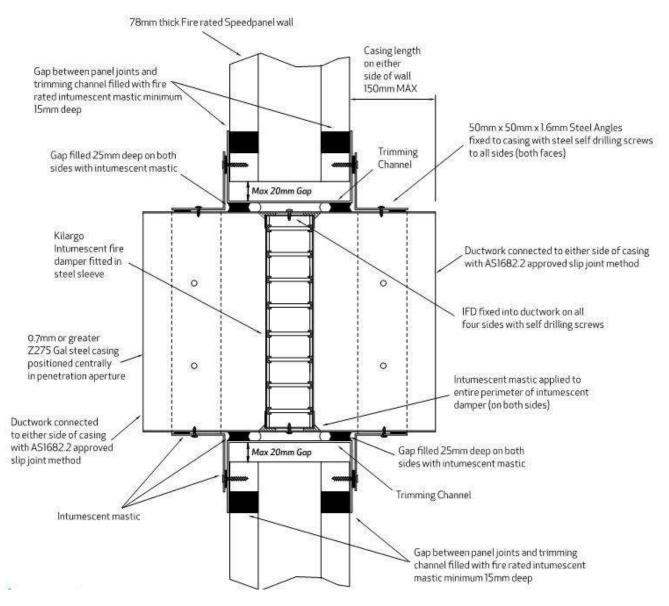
Example of a Kilagro Fire Damper in a Speedpanel Wall
